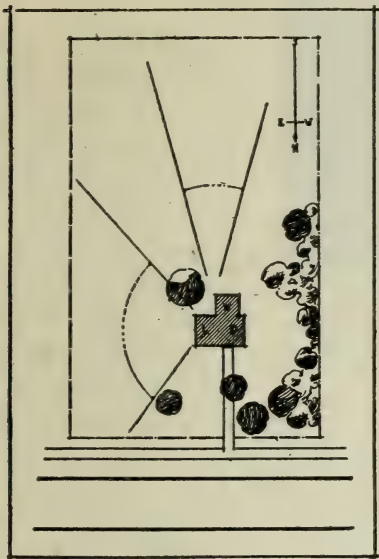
FIG. A — Planting plan to insure best effect of shade, outlook, protection, and privacy on a lot facing north
